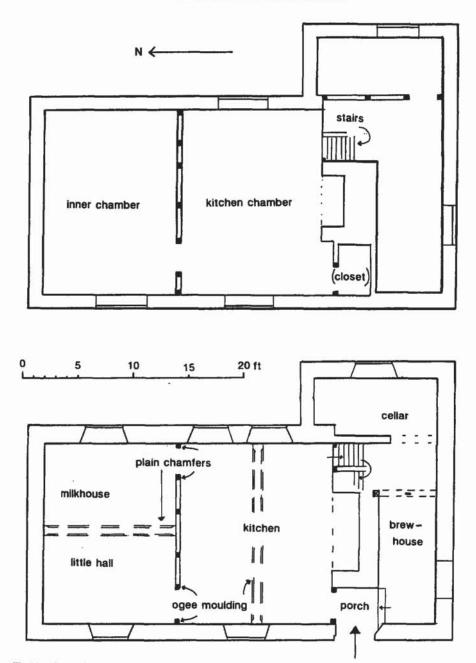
Ground-floor (below) and first-floor plans of Colden Farm, showing the original stairs as they were in 1980. Later additions have been omitted.
